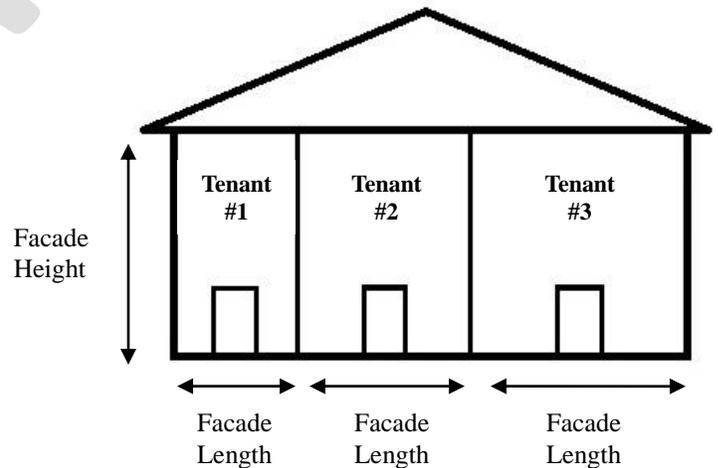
Multi-Tenant Façade Calculation Example #2
